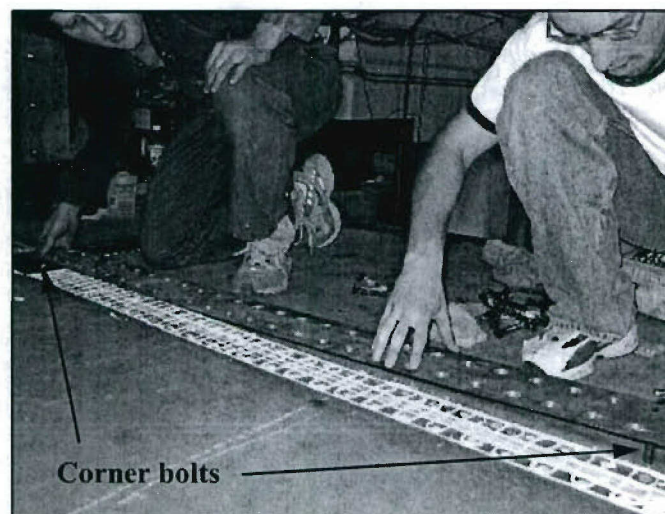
Bolt Torque Pattern Used for Installation of the Doubler Centerpiece
